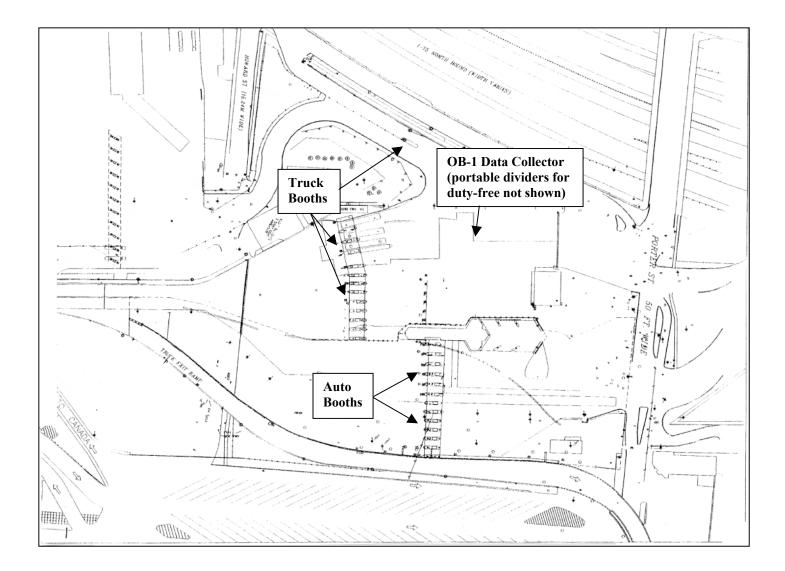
Layout at the Outbound 1 (OB-1) data collection site on the Detroit side.
